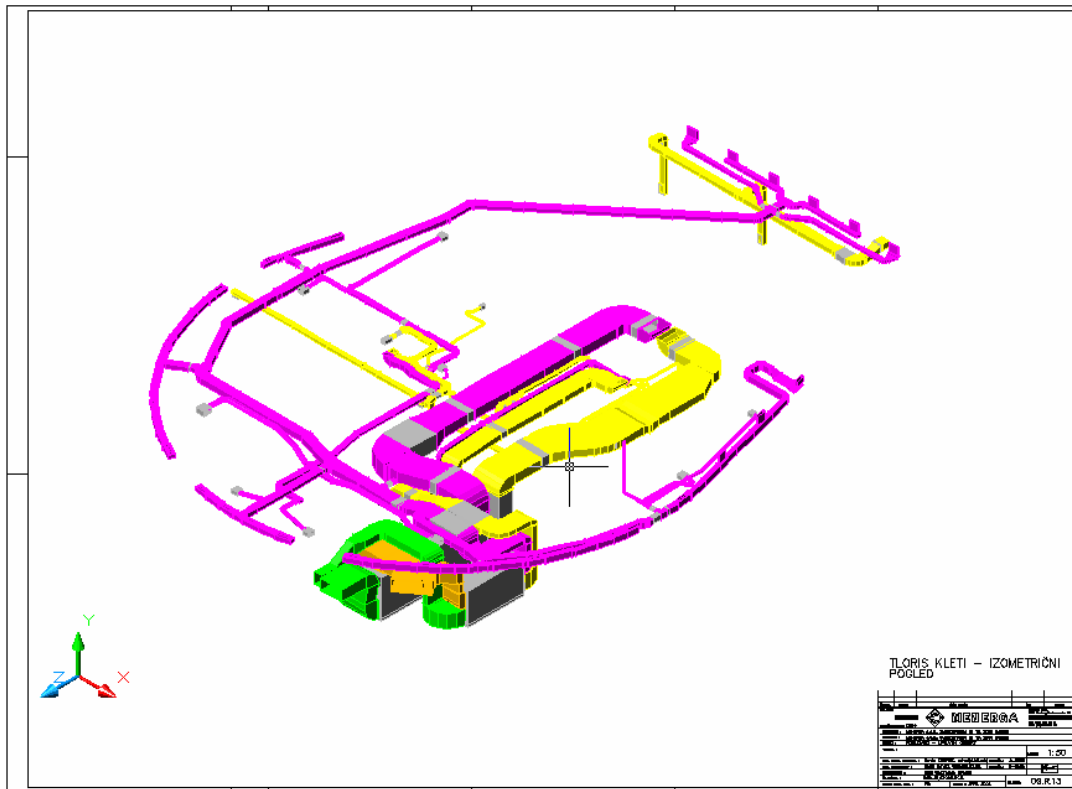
3D ventilation systems in the cellar floorplan of the Menerga building
